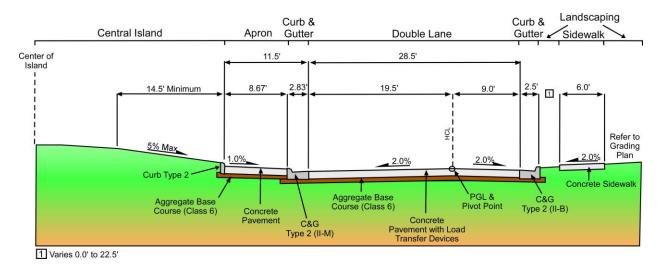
Typical Section of an Urban Double-Lane Roundabout
